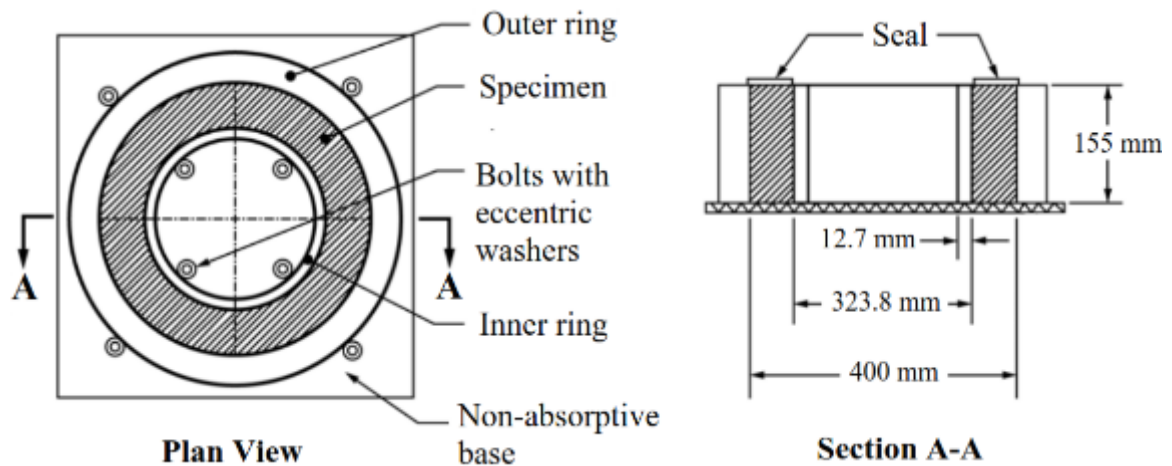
Ring test specimen mould (from ASTM C1581-18a (2018))
